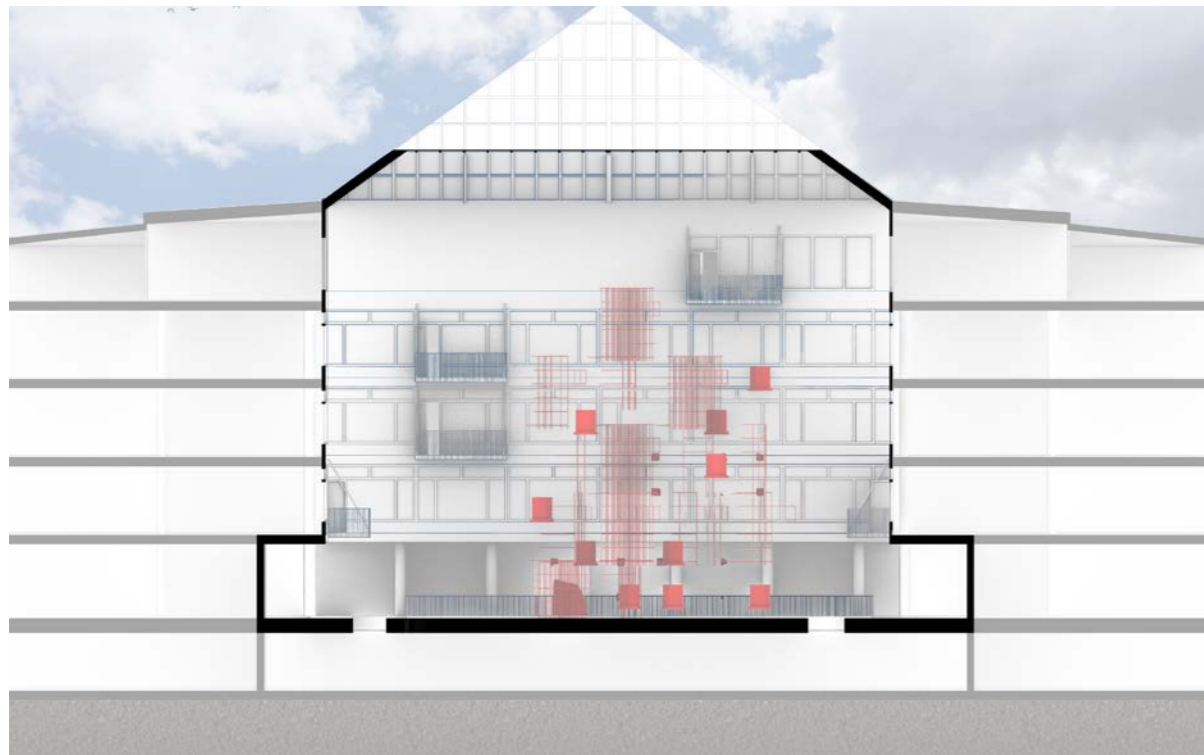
East elevation AA of Installation two and the atrium 1:350 0 4 8 12 16 20m
